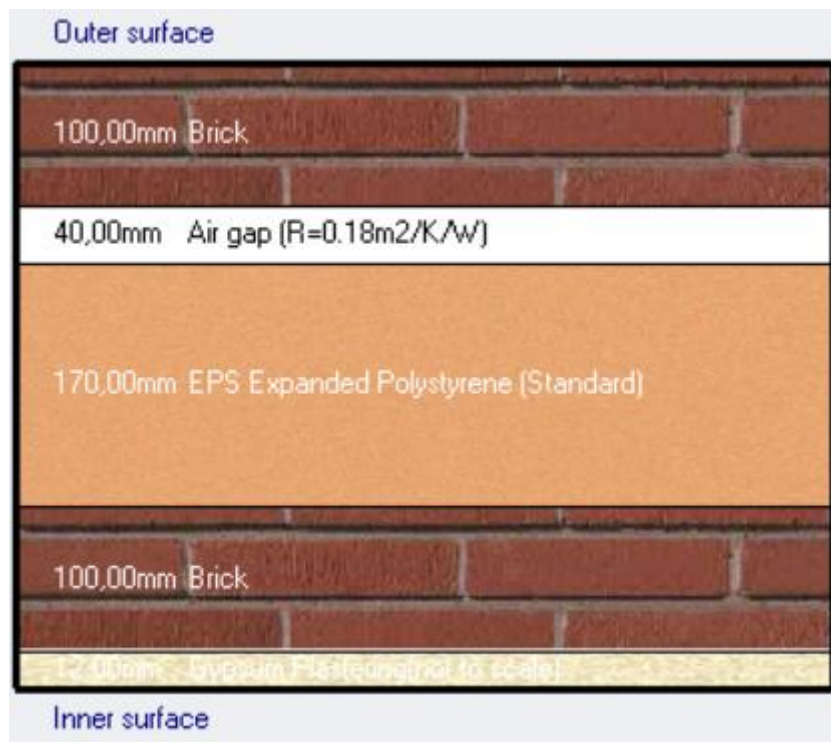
Detail of the exterior wall of both houses in DesignBuilder (high insulation)
